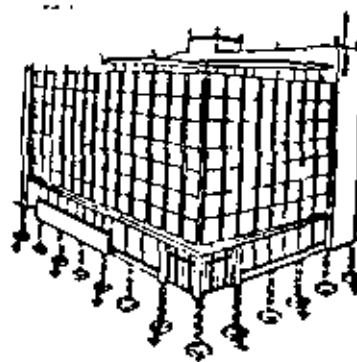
Steel building: Steel framing in tall buildings should be connected to air terminals. This type of structure requires special lightning protection.
